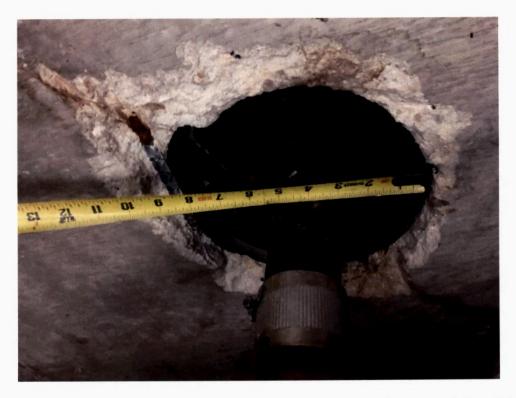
Spalled Concrete Slab above Electrical Room at Ground Floor
